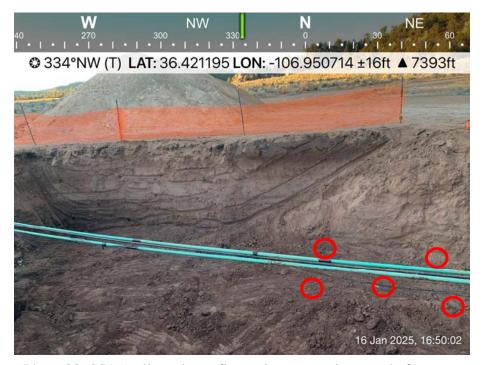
SS15 collected as a five-point composite sample from northeast base of excavation.
